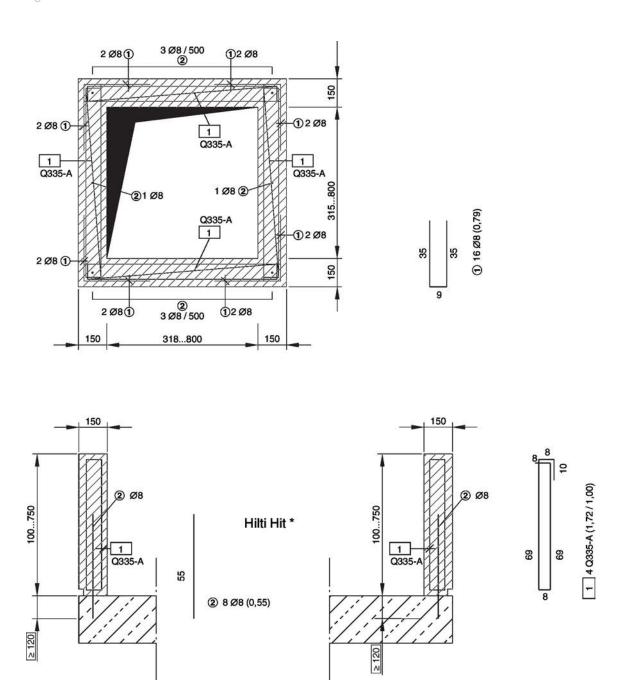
Reinforcement plan for concrete bases with a height of 100 to 750 mm
